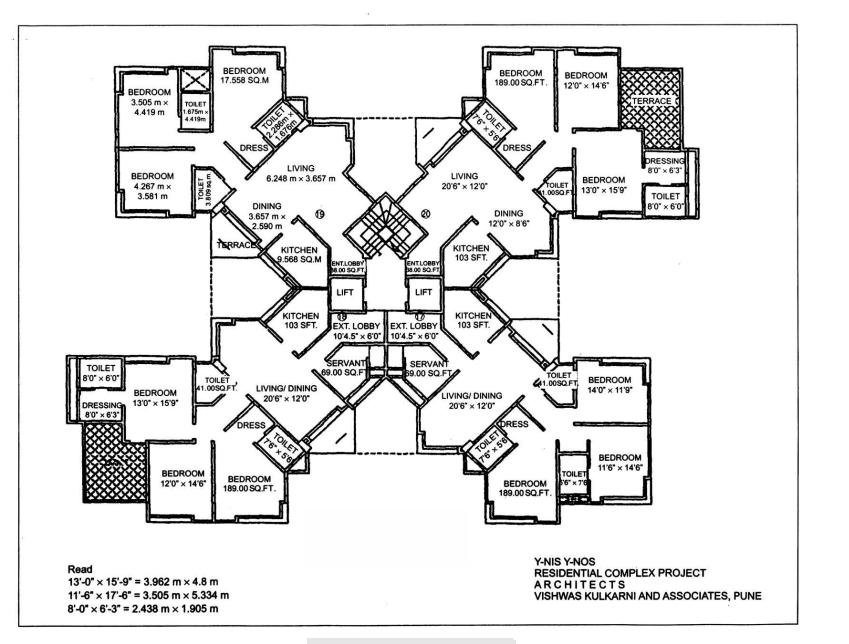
Y-NIS Y-NOS Third Floor Plan
